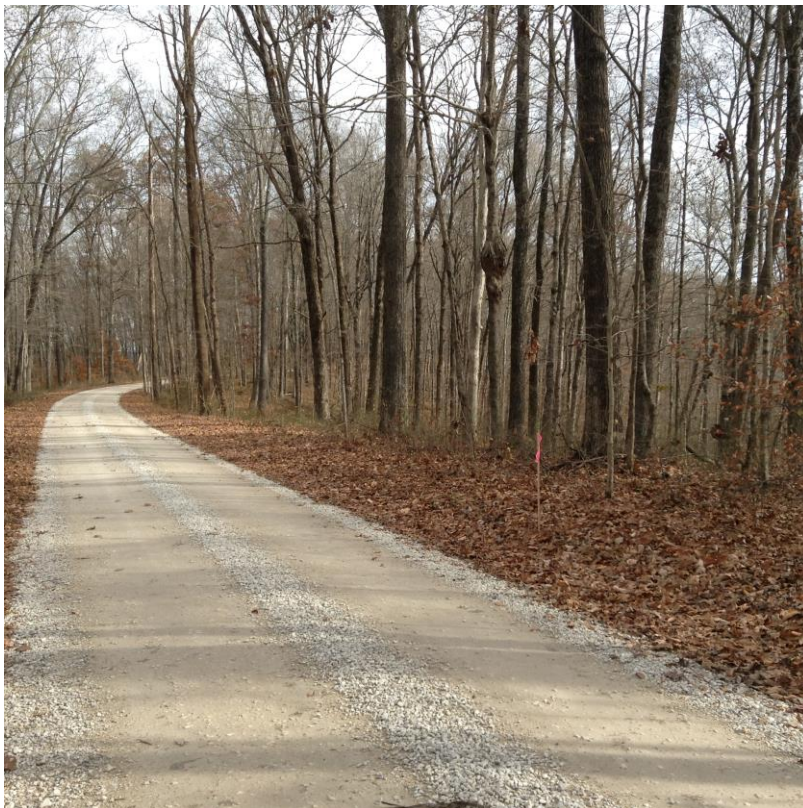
E Rust RD – facing northeast (lot 4 marker)
